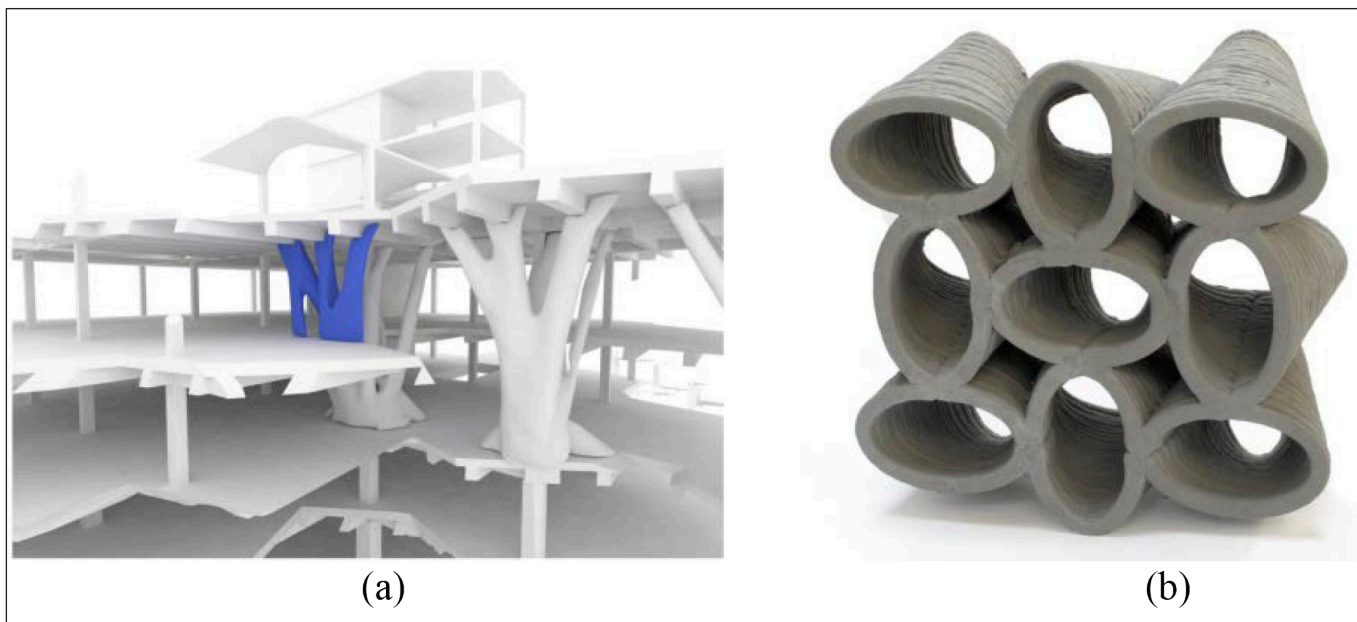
Examples for large-scale application, a) Architectural context for the multifunctional wall element, and b) Concrete 3D printed acoustic damping wall element (Gosselin et al., 2016)
